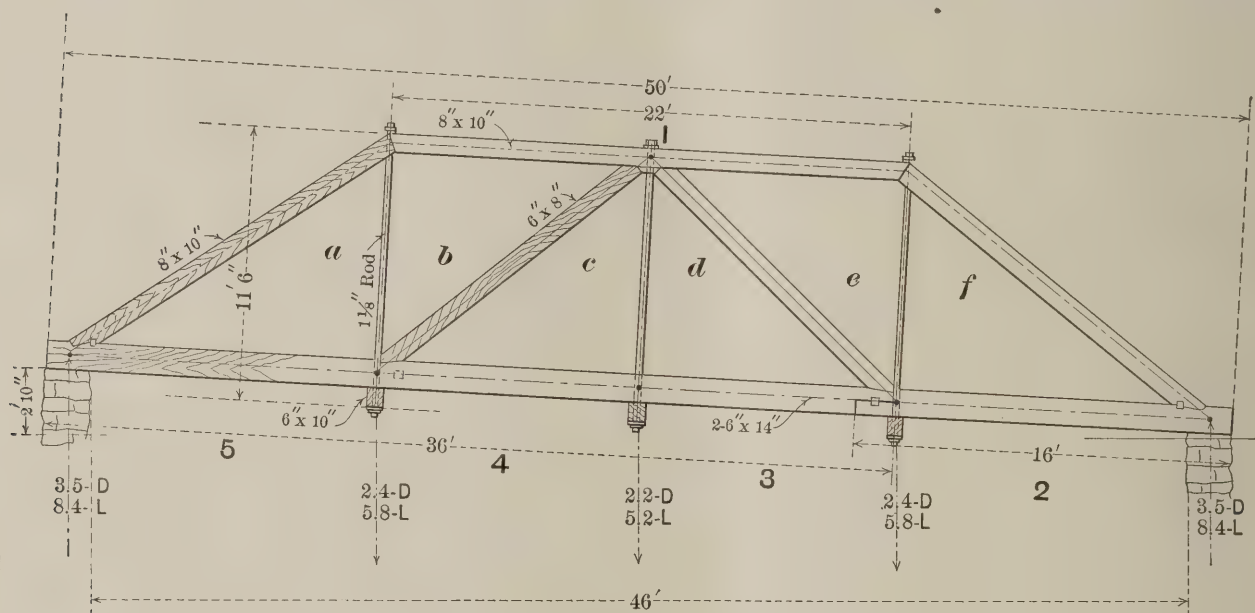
Elevation of the Truss, Showing Dimensions of Various Members—Scale,  $\frac{1}{8}$  In. to the Foot.
